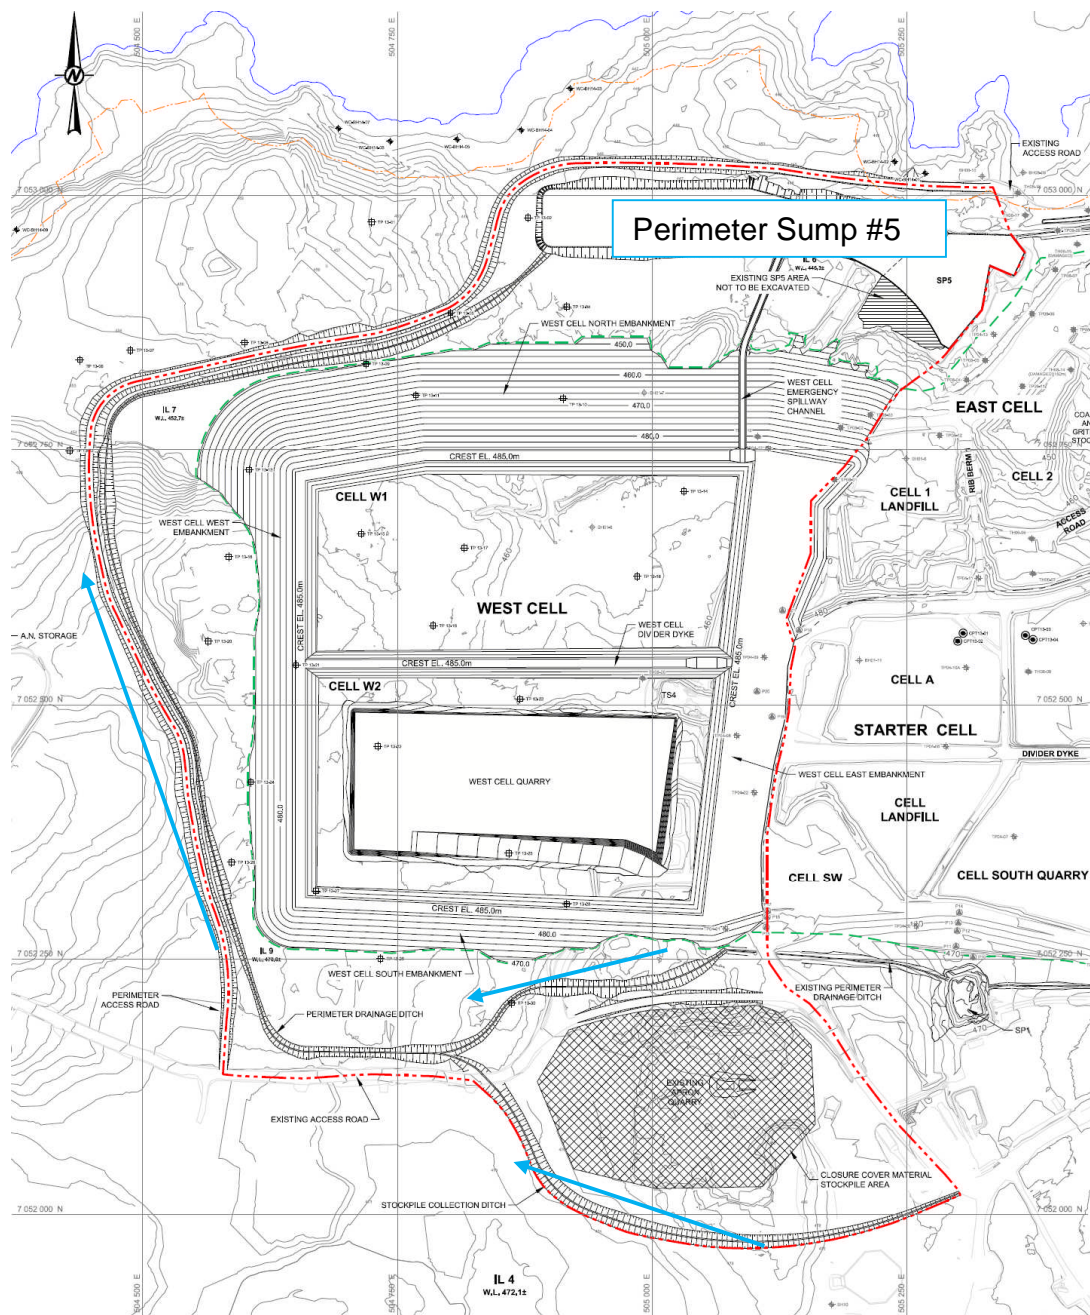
West Cell Perimeter Water Control Structures Layout Plan
